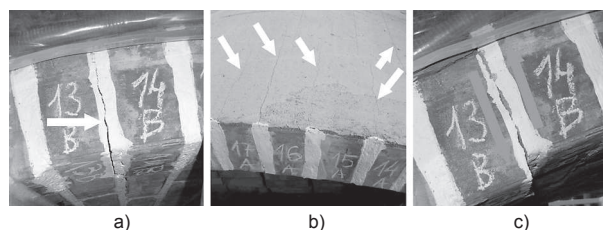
Failure mechanisms of specimen S11W: a) first crack observed between 13B and 14B brick courses; b) cracks at extrados in strengthening layer observed after backfill removal; c) sliding along a mortar joint beneath the load application point.
